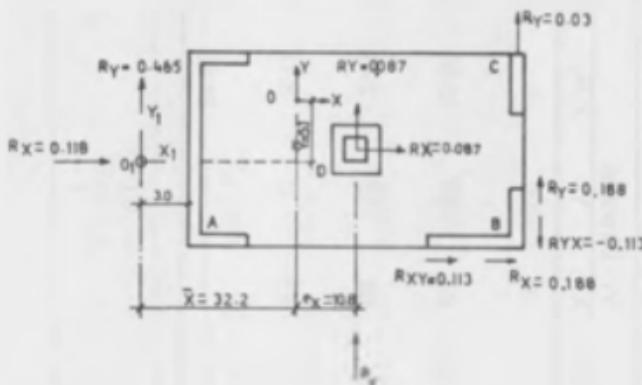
Summary of rigidities of shear walls and location of the shear centre O of the structure.
